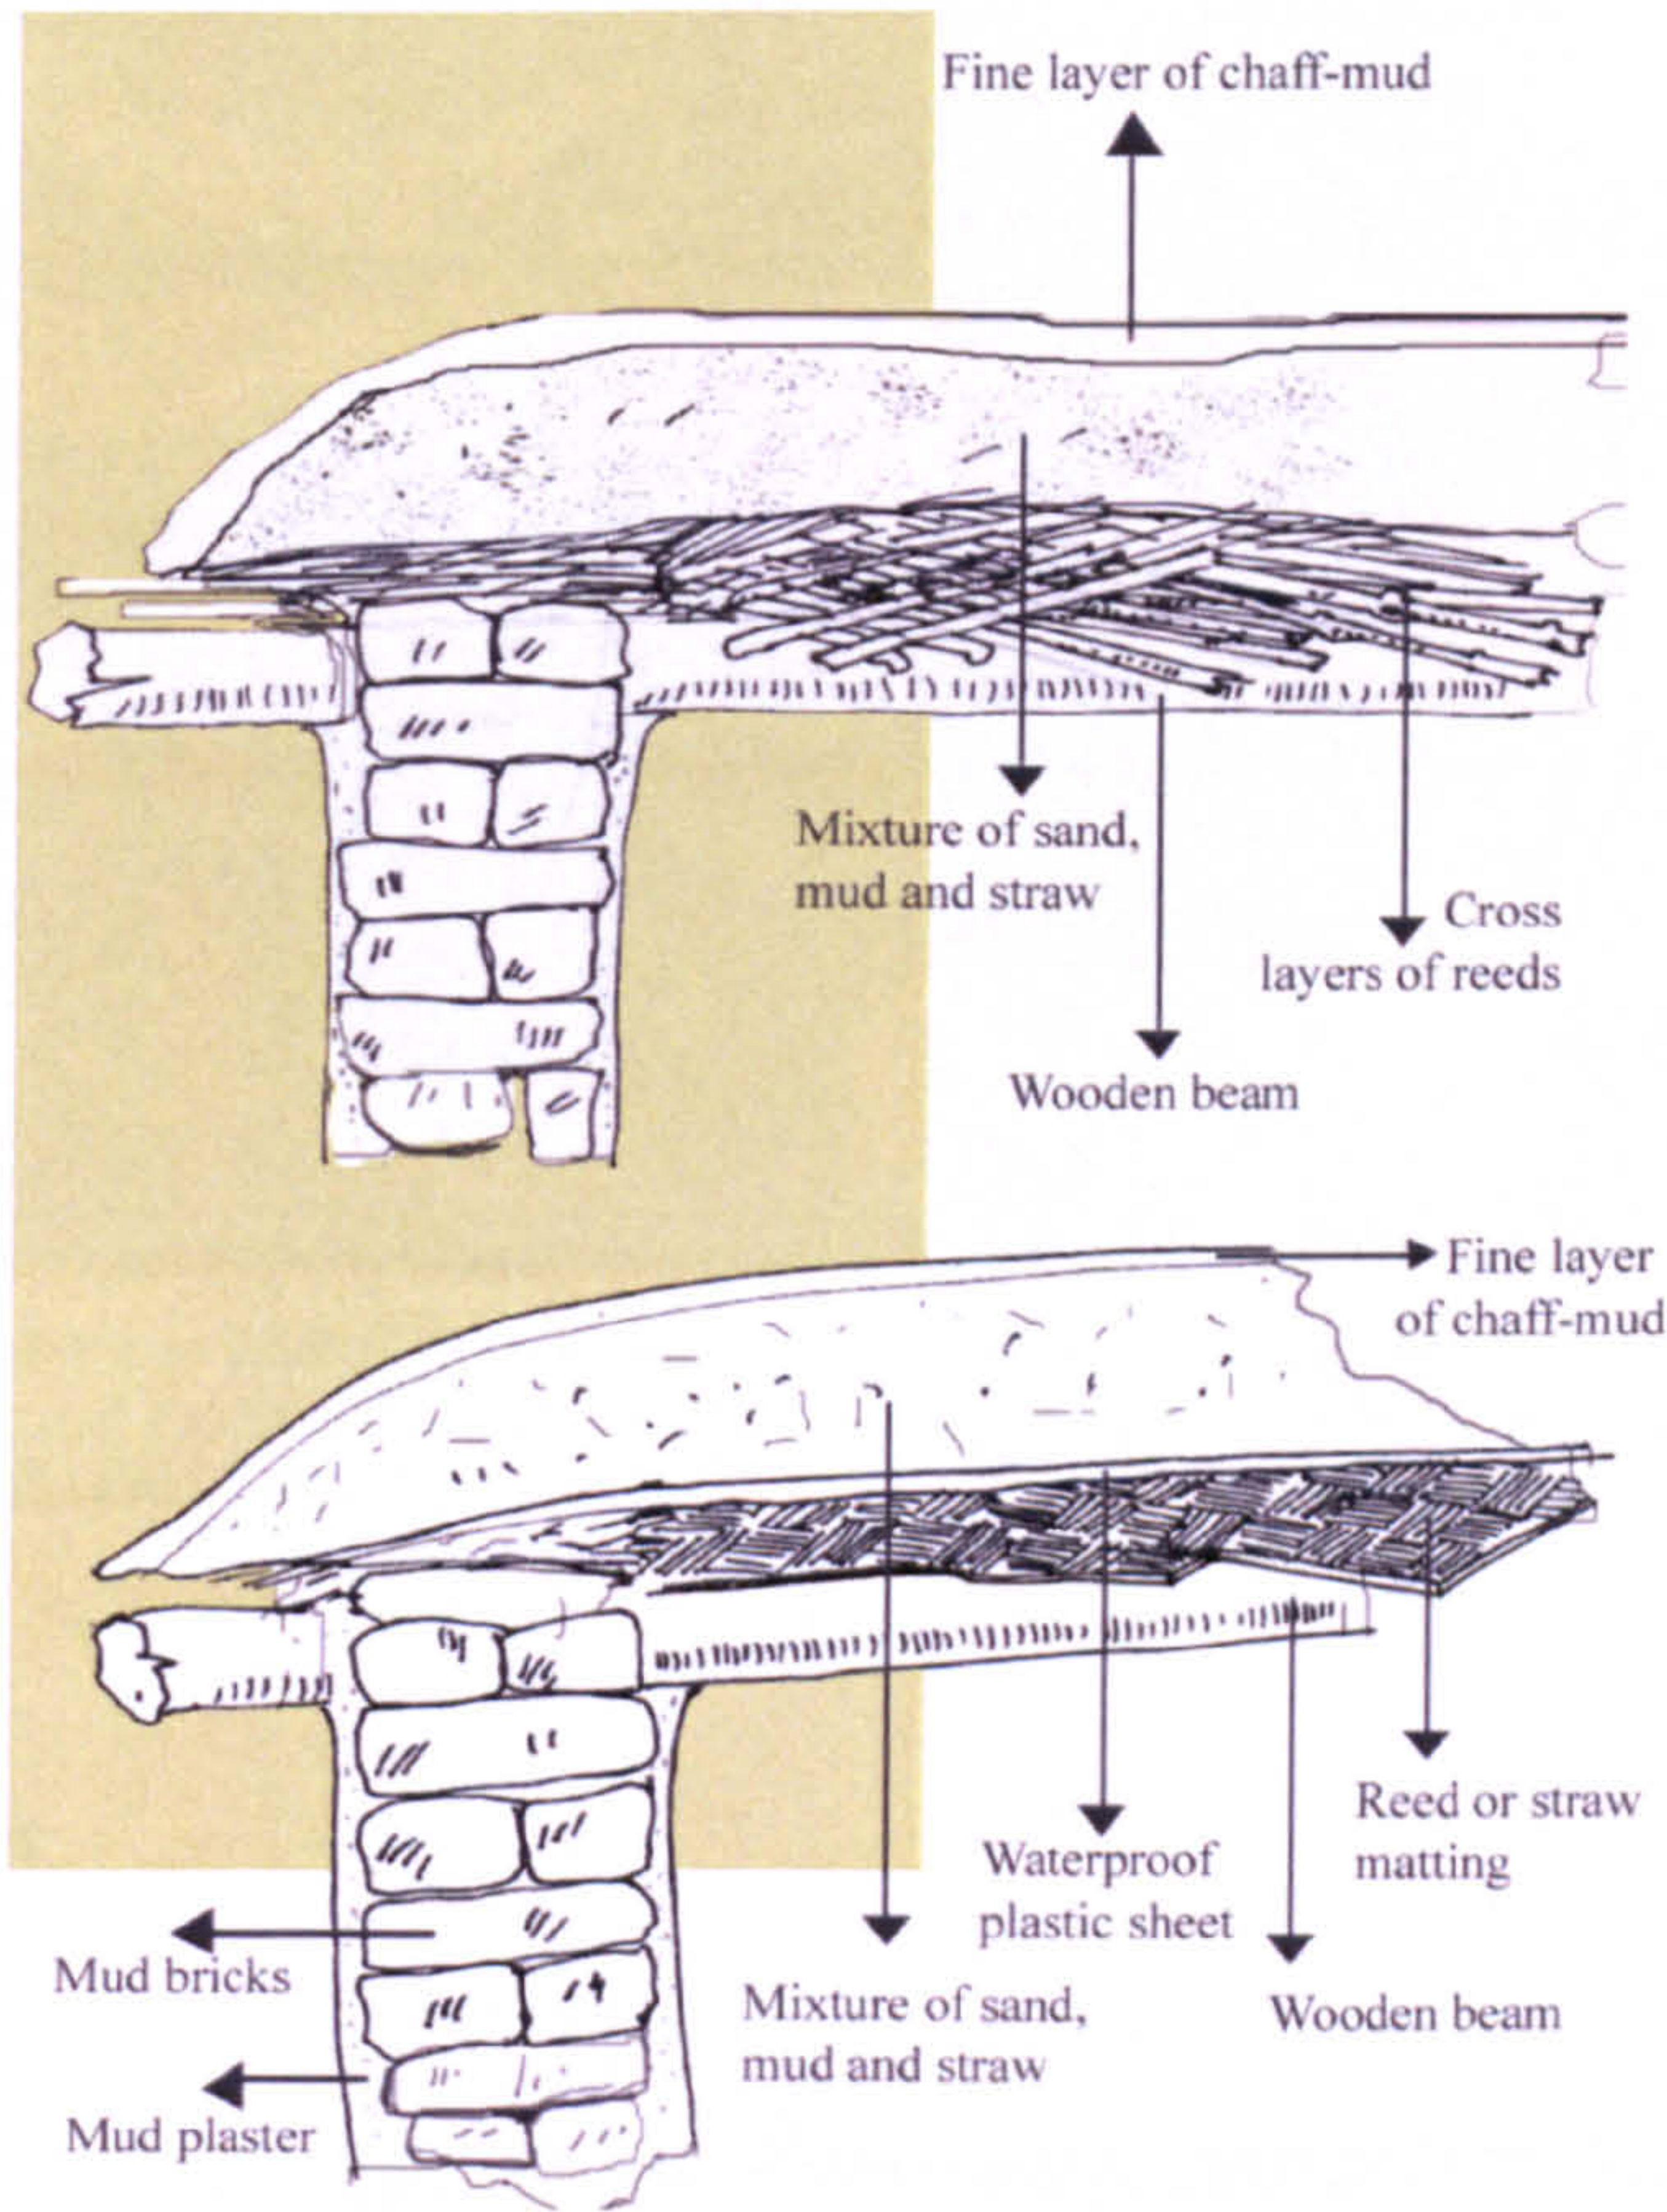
The structure of two types of flat roofs in rural areas of Baluchistan. They consist of the supporting beams, reed matting, plastic sheets as insulation and waterproof surfaces. Source: Author
